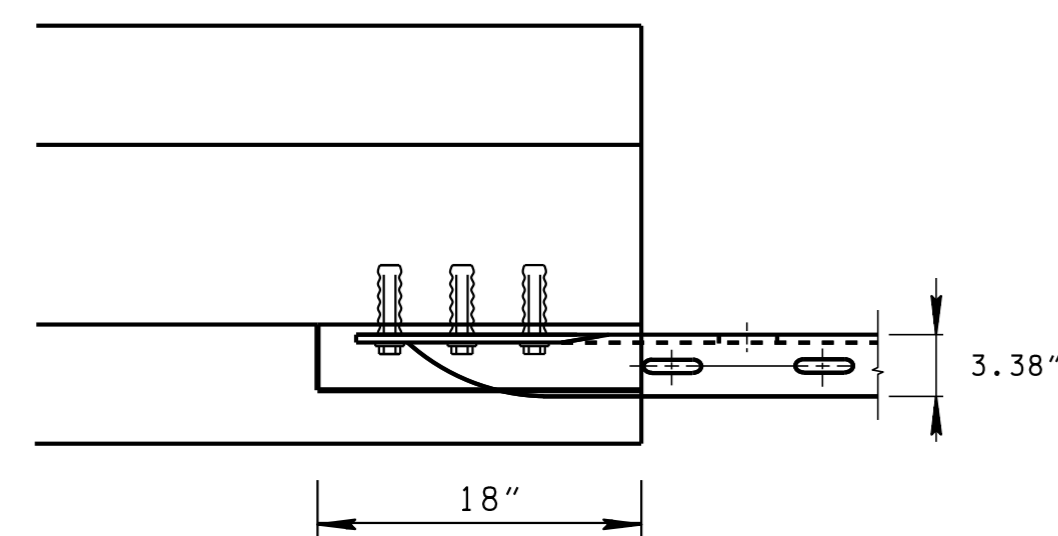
DETAILS OF REINFORCING AT WALL ENDS OR EXPANSION JOINT FOR CONCRETE BARRIER
